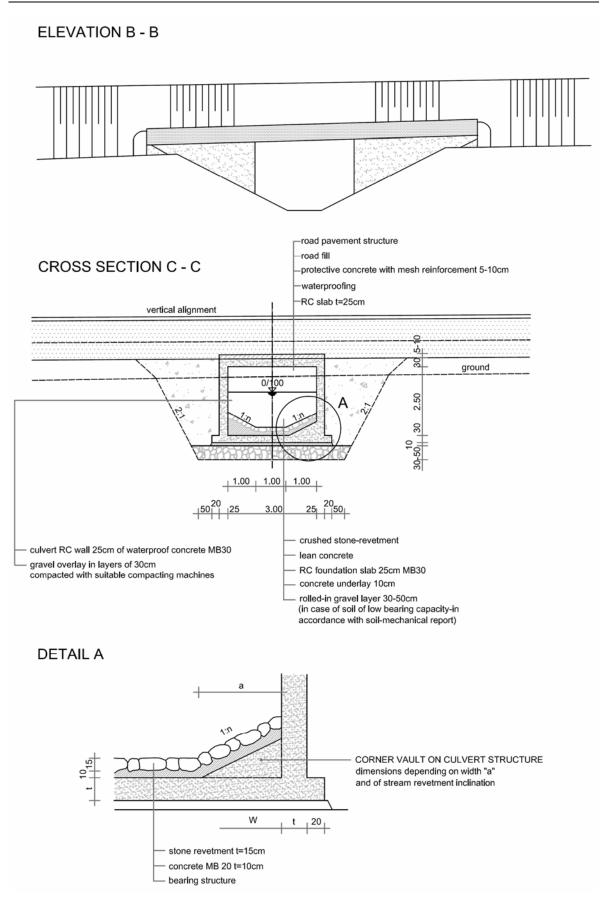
Elevation B-B and cross section C-C belonging to figure 6.4 including detail A of box culvert bottom revetment
